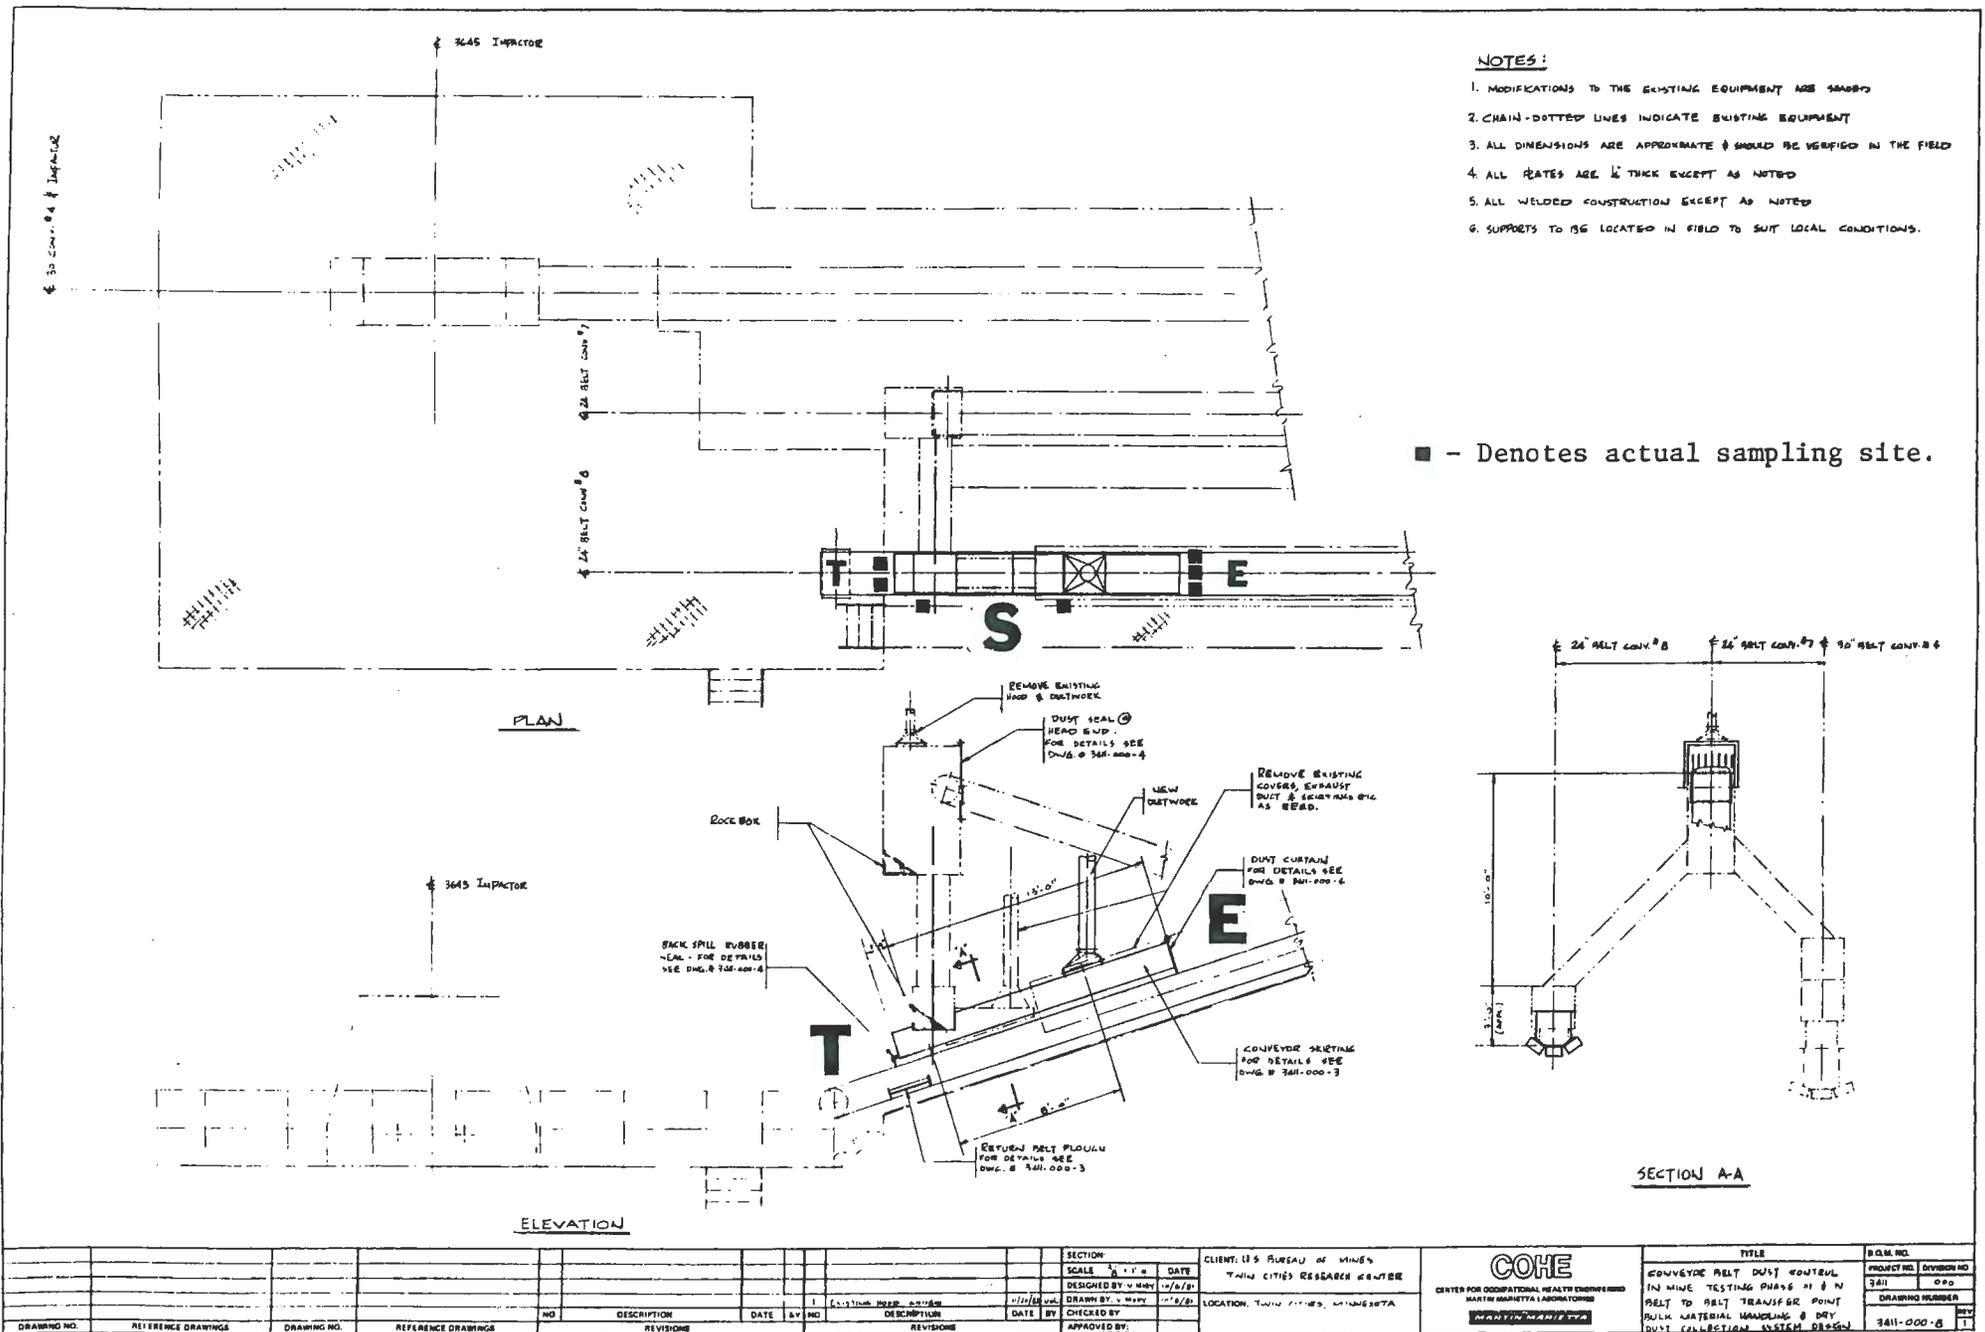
Sampling locations at the belt conveyor #7-to-belt conveyor #8 transfer point.
